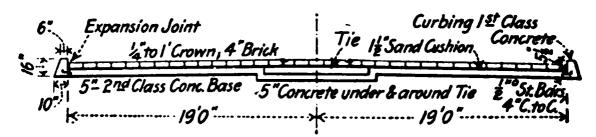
A. — Village Street, Brick Pavement. Tracks in center, "T Rail Special Grooved Brick
